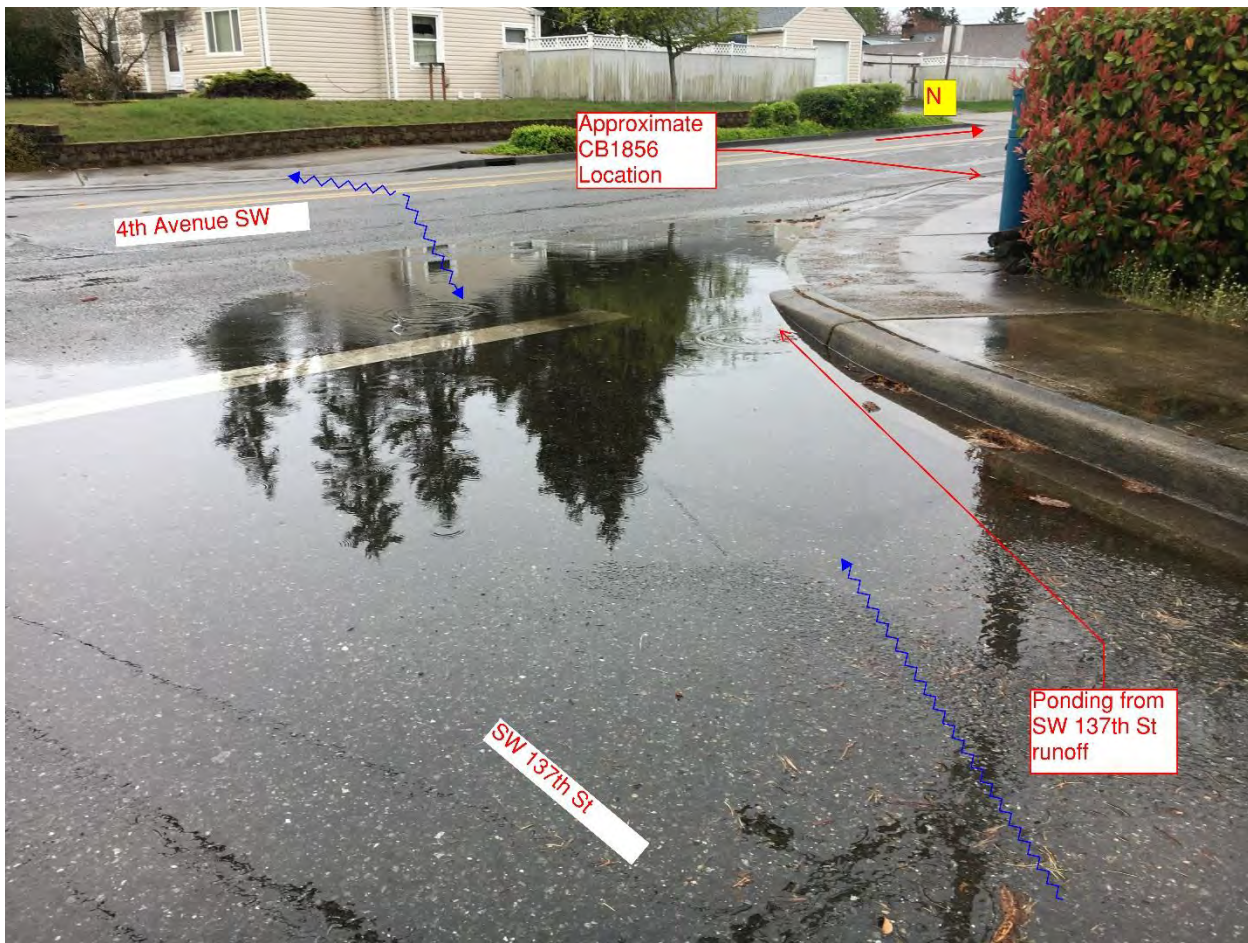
Ponding at NE corner of SW 137th Street and 4th Avenue SW. Photo date 4/8/2019
